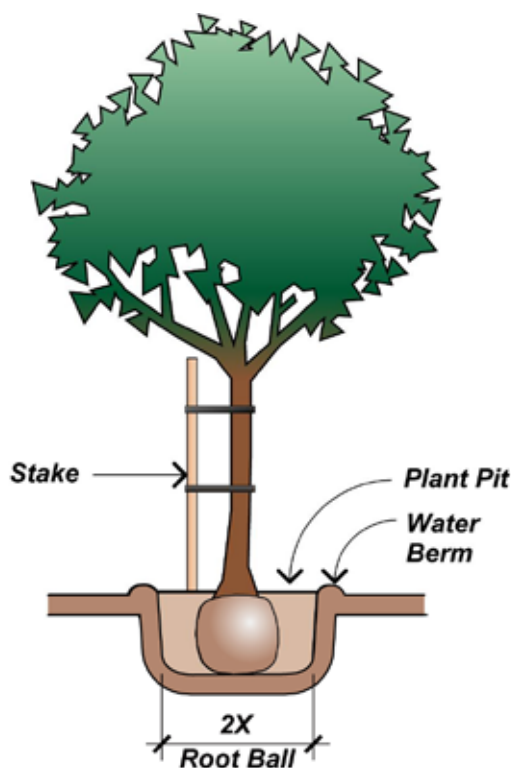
Illustration of planting pit for trees (not to scale). See Section 8.3 for planting details.
